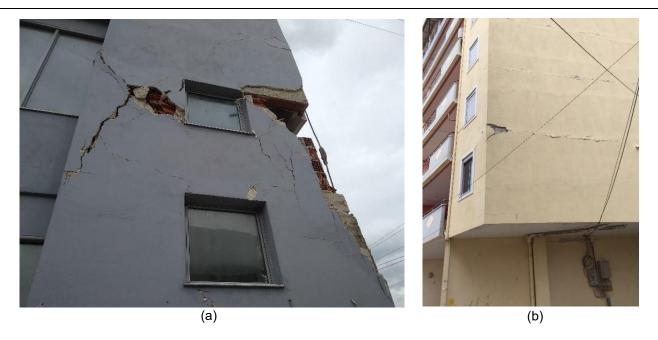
Examples of masonry infill damage in reinforced concrete buildings: (a) Fushë-Krujë and (b) Krujë (source: Nikolić-Brzev et al., 2020).³⁹
